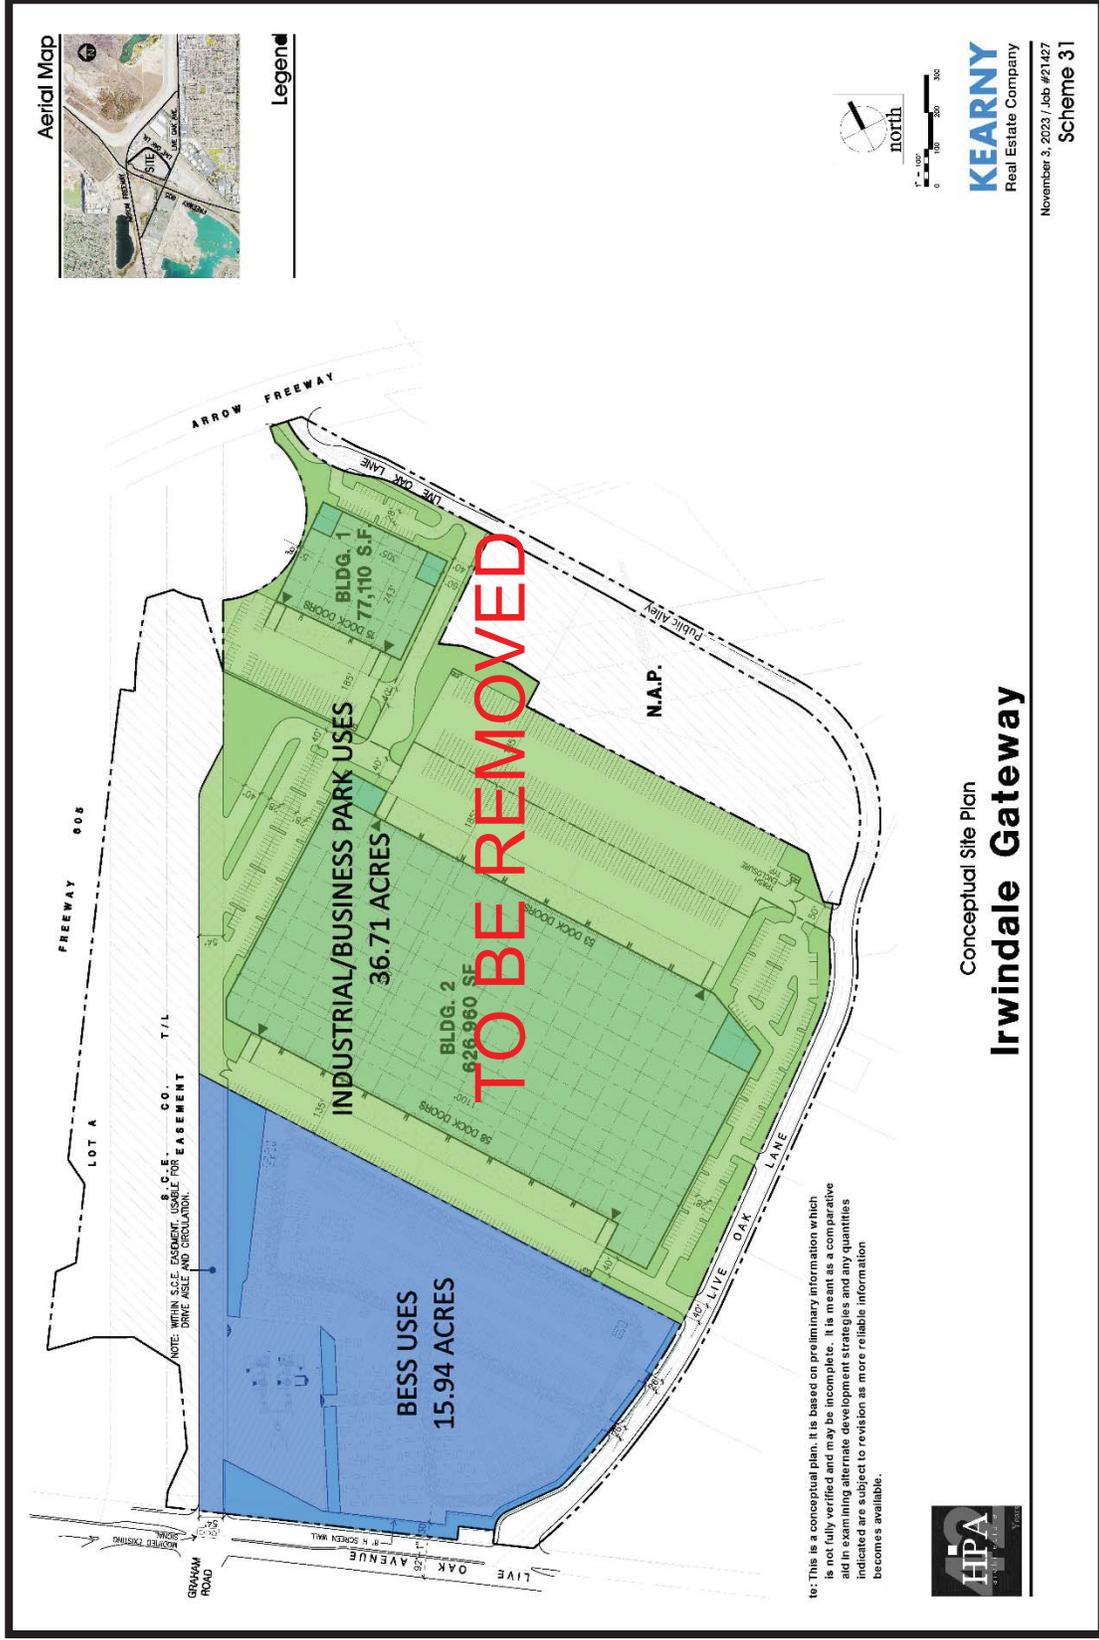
LAND-USE PLAN NO.-2
